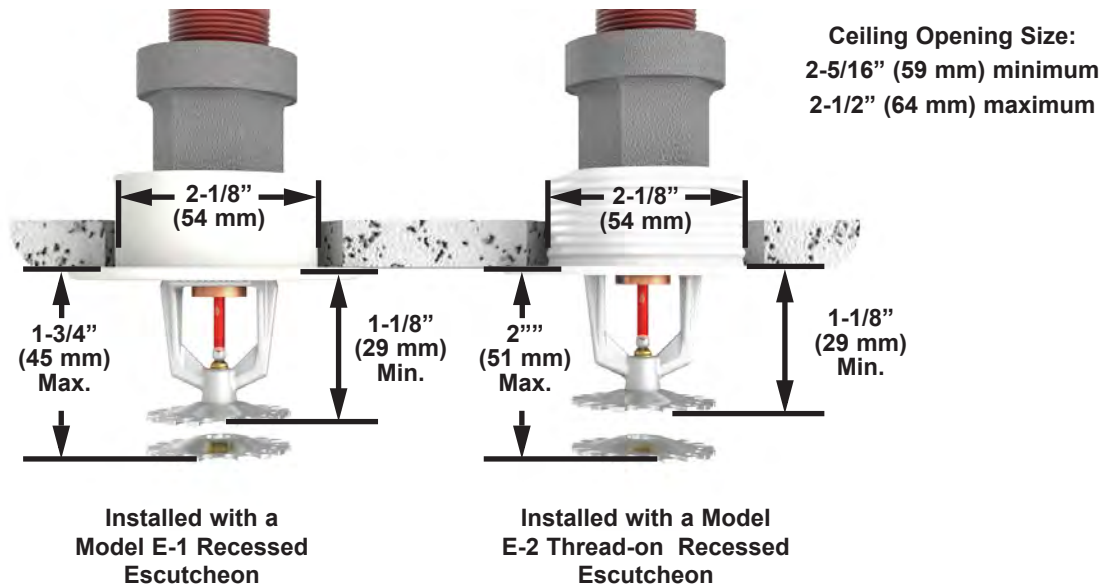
Sprinkler Dimensions with the Model E-1 and E-2 Recessed Escutcheons
